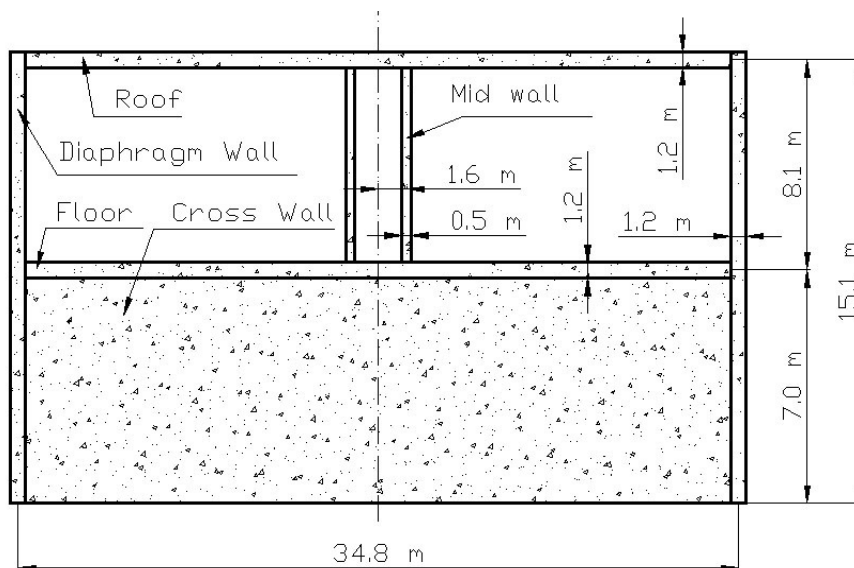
Dimensions and layout of the Evaluation Model with cross walls, cc 4.5 m underneath the floor slab. [5]
